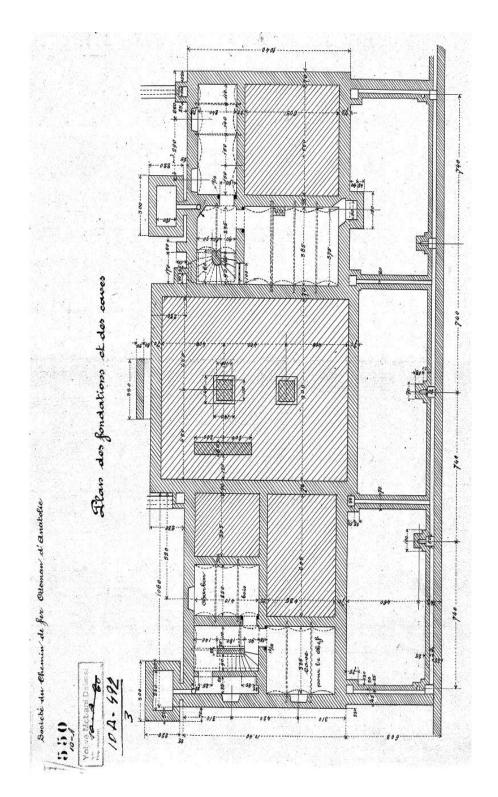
Ist class station building project drawn for Konya / Basement plan
